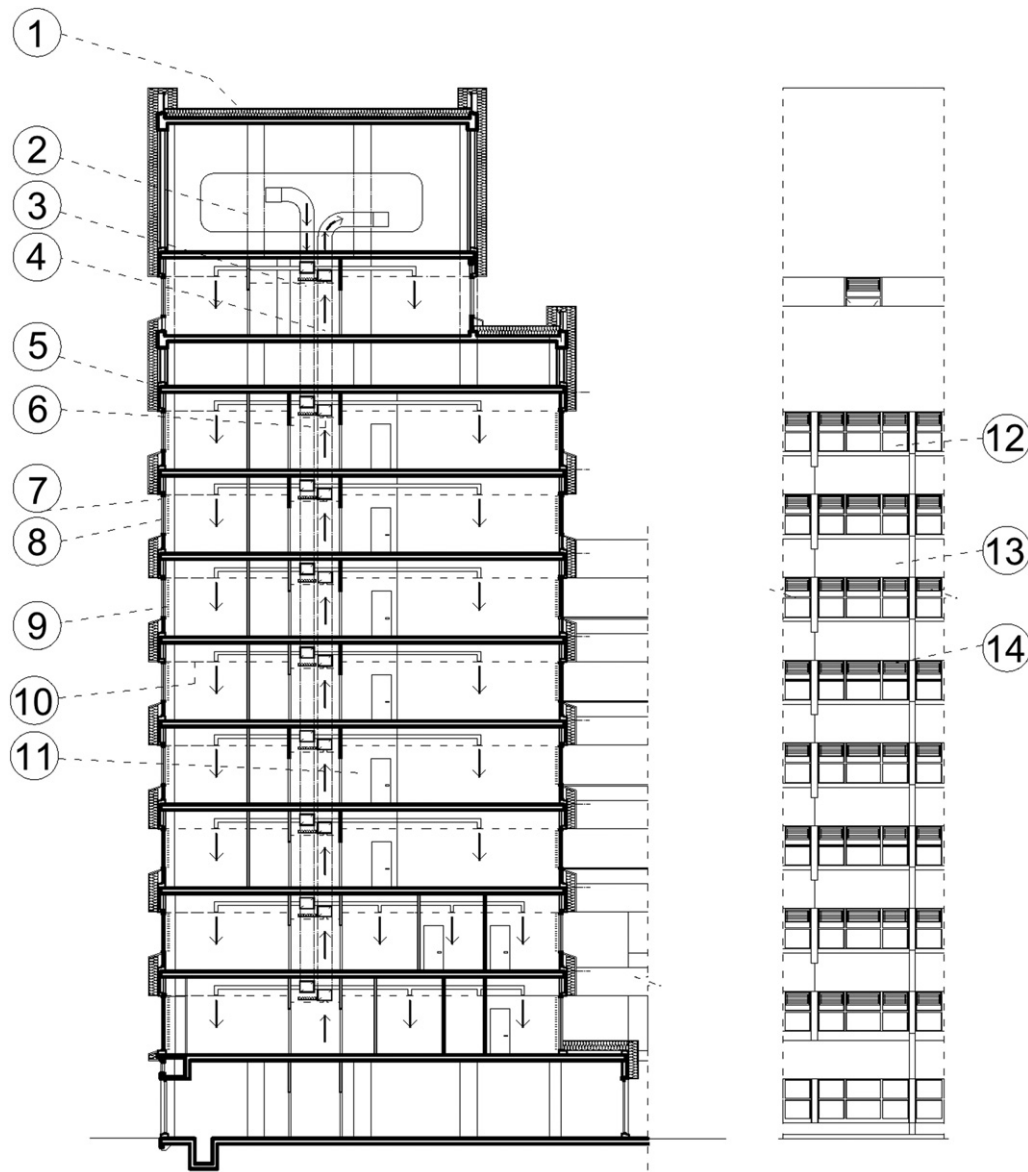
Option 1: SMVHC, sealed building, mechanical ventilation with heat and cooling. Key: 1 Insulation on roof (100 mm); 2 Air handling unit with supply and extract; 3 Supply duct; air supplied to wards via ceiling, 6 ach; 4 Return duct; 5 100 mm insulation to external elevations; 6 Air extracted through corridors; 7 Seal windows; 8 Triple glazed windows; 9 Add blinds between original double glazed unit and new single-glazed panel; 10 Radiant ceilings inactive; 11 Mechanical ventilation to bathrooms maintained; 12 Triple glaze and seal windows; 13 100 mm external render; 14 Blinds added between original double glazed window and new glazed panel.
